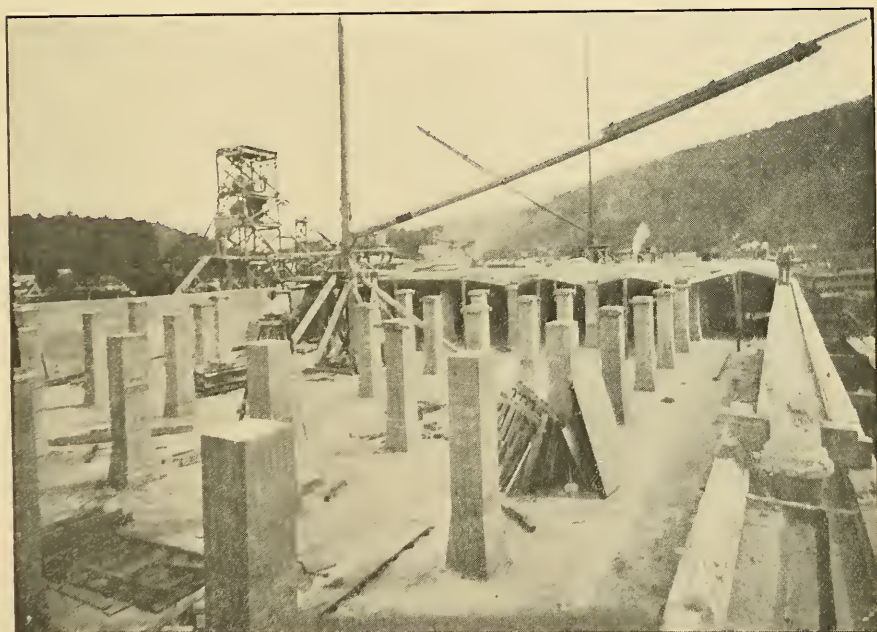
METHOD OF SUPPORTING ROOF FORMS.
